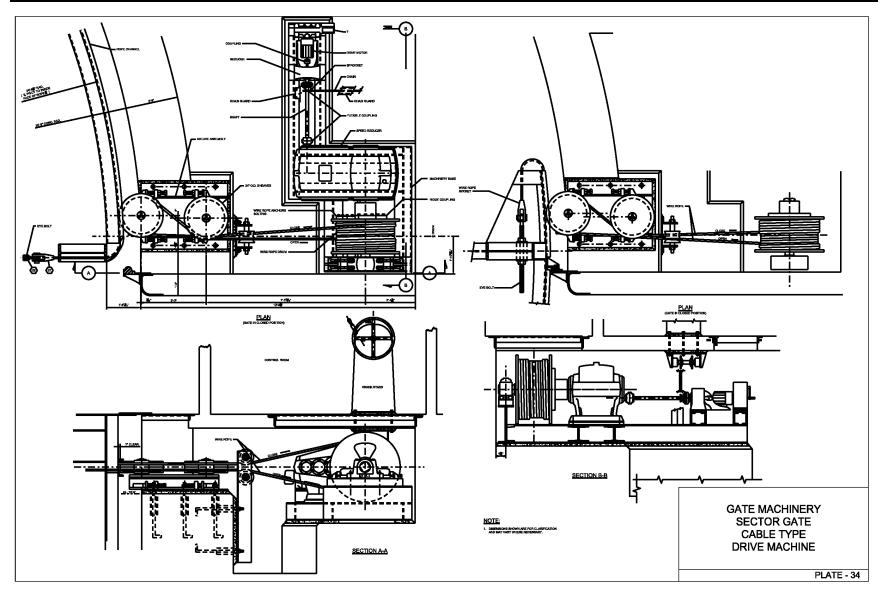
Plate 34: Gate machinery, sector gate, cable type drive machine
